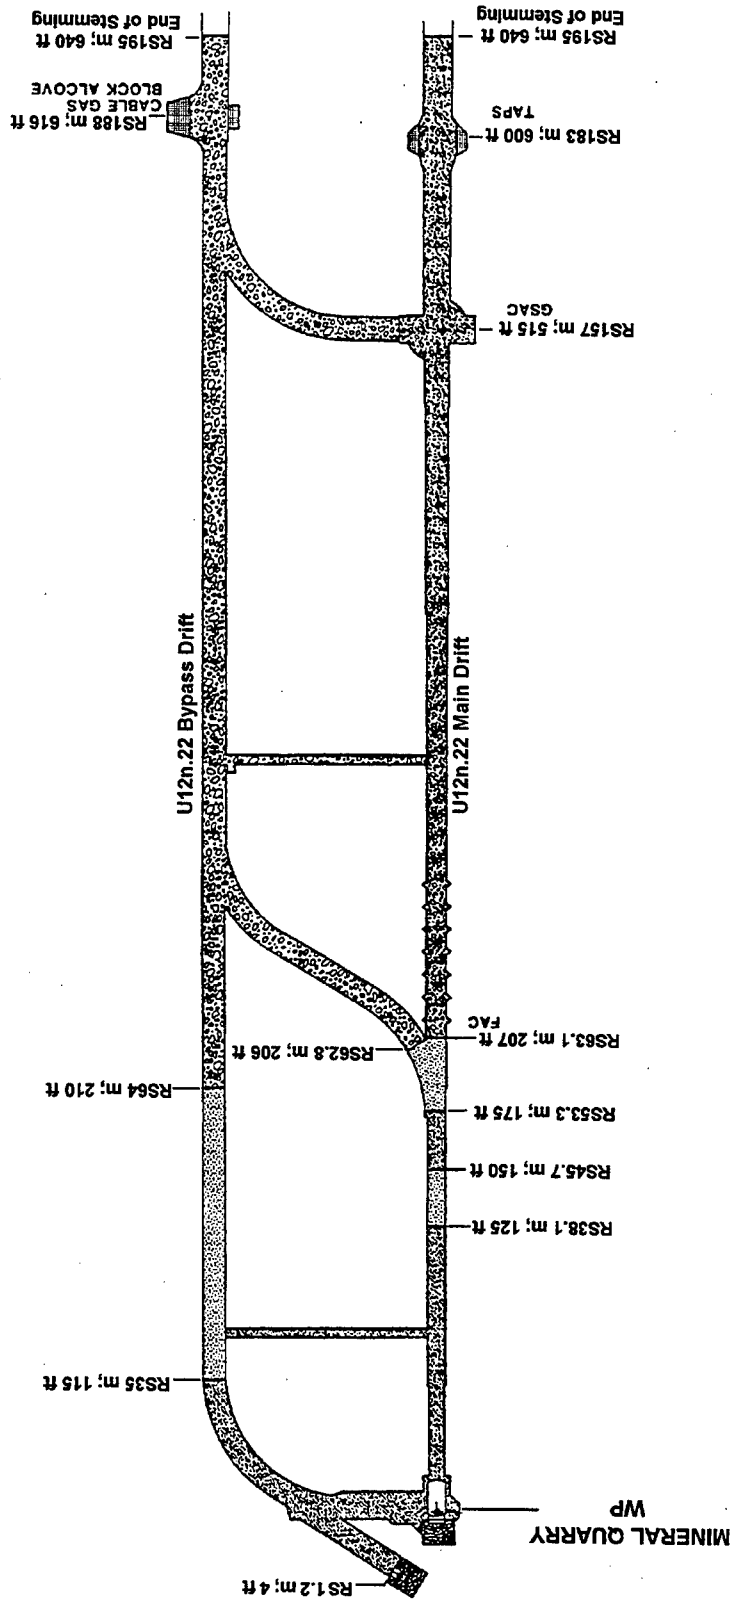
MINERAL QUARRY test - tunnel facilities layout.
